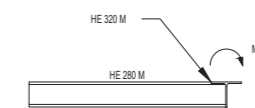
Longitudinal section of the cantilever loading the border beam
